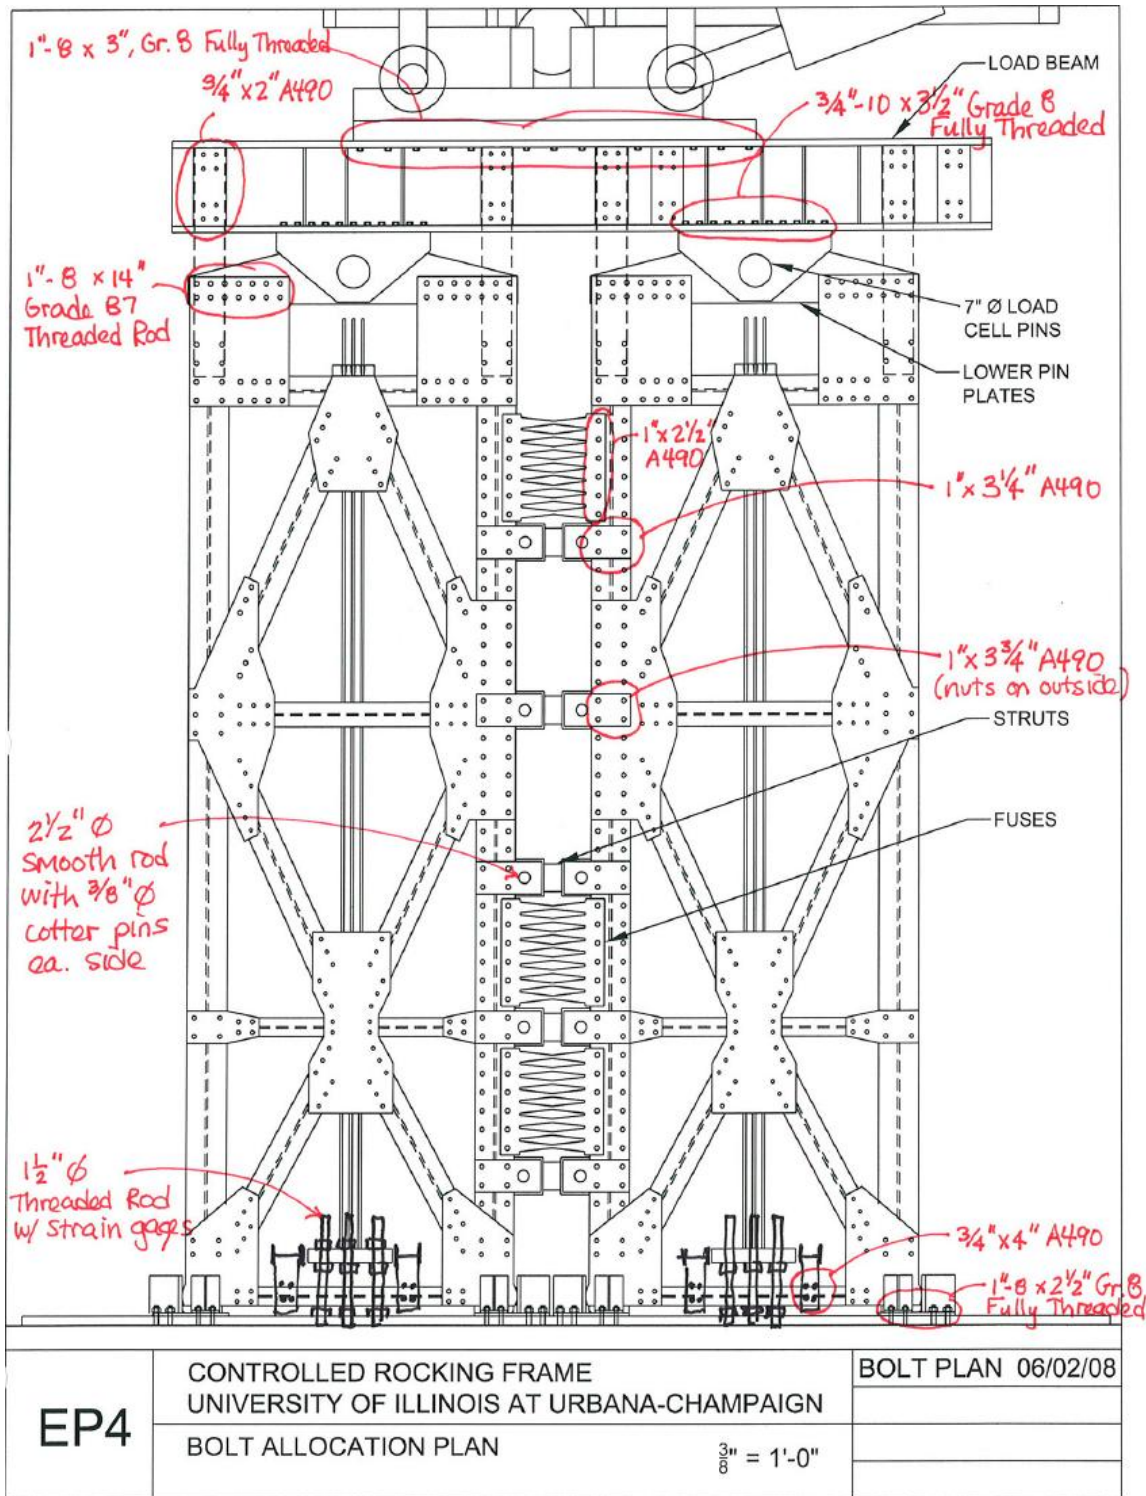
Erection Plan Drawing – Bolt Allocation Plan
